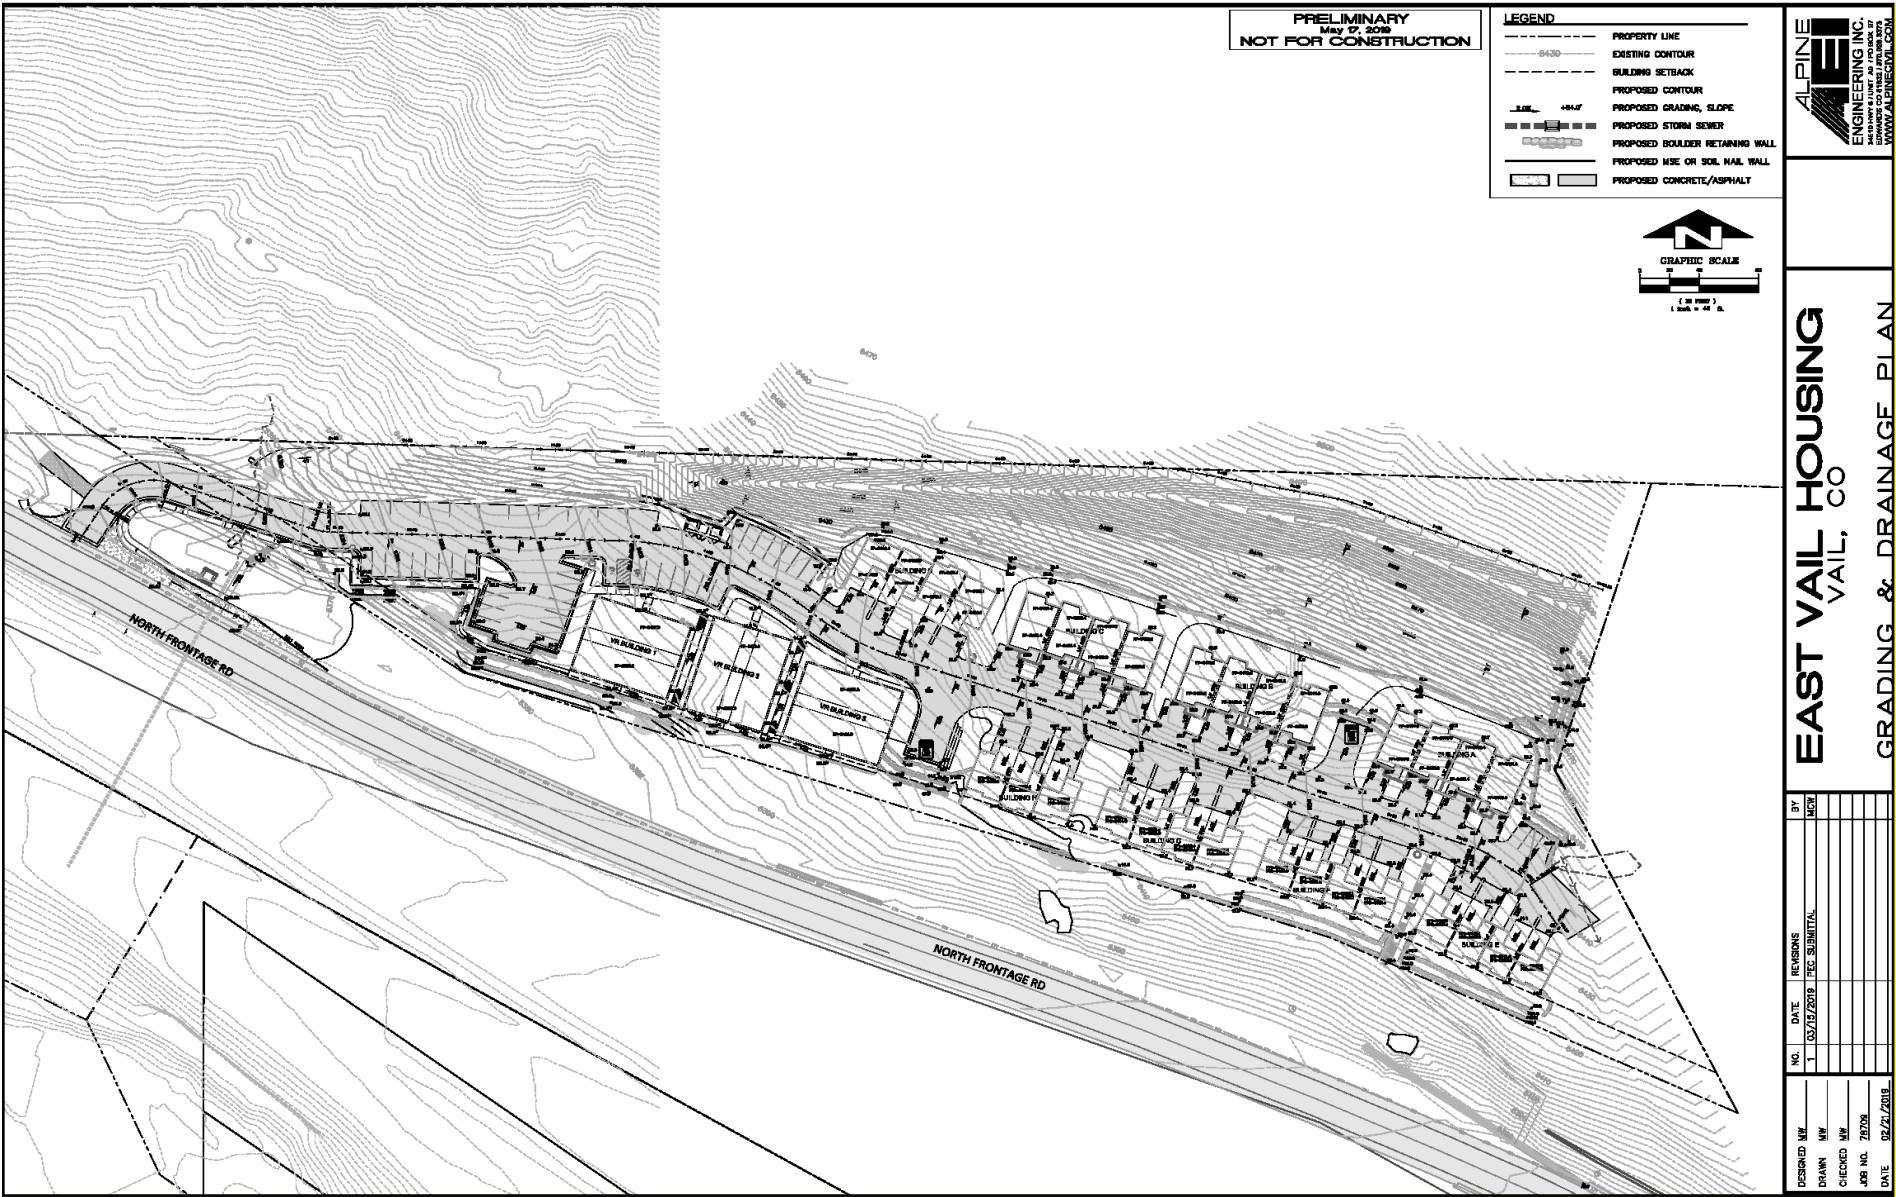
East Vail Workforce Housing Subdivision site plan.
